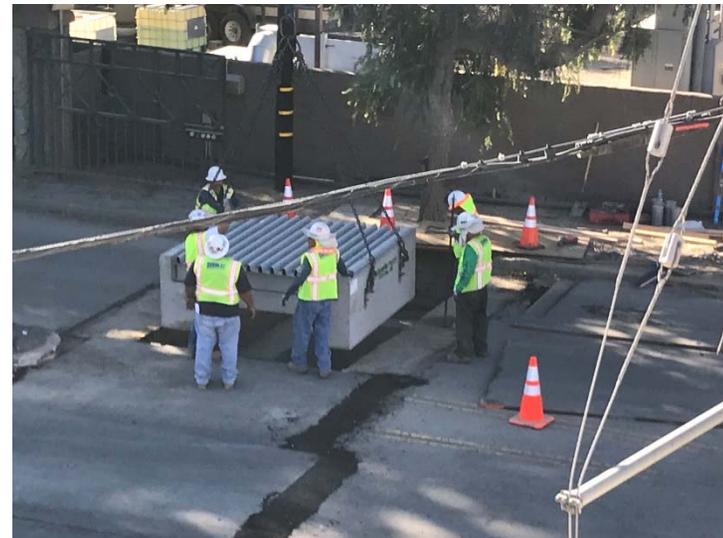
Terminal Basin Outlet Roadway Cattleguard Construction: September 26, 2017
